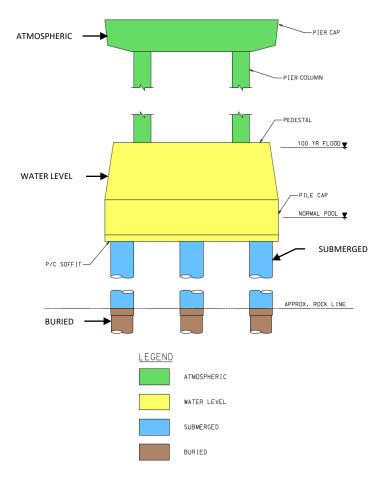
Typical exposure zones for Piers 3 and 4 at the expansion joints.
